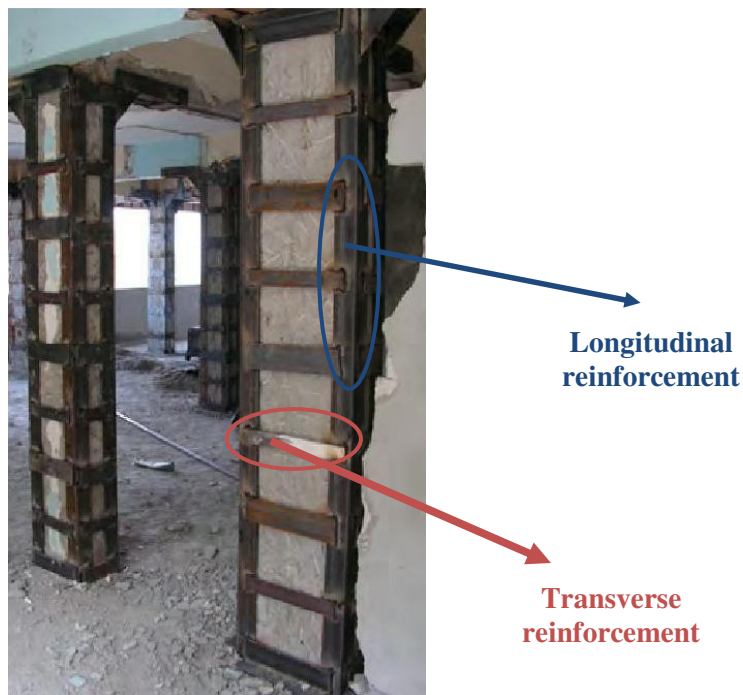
3: Steel jacking retrofit: application of longitudinal and transverse reinforcement
